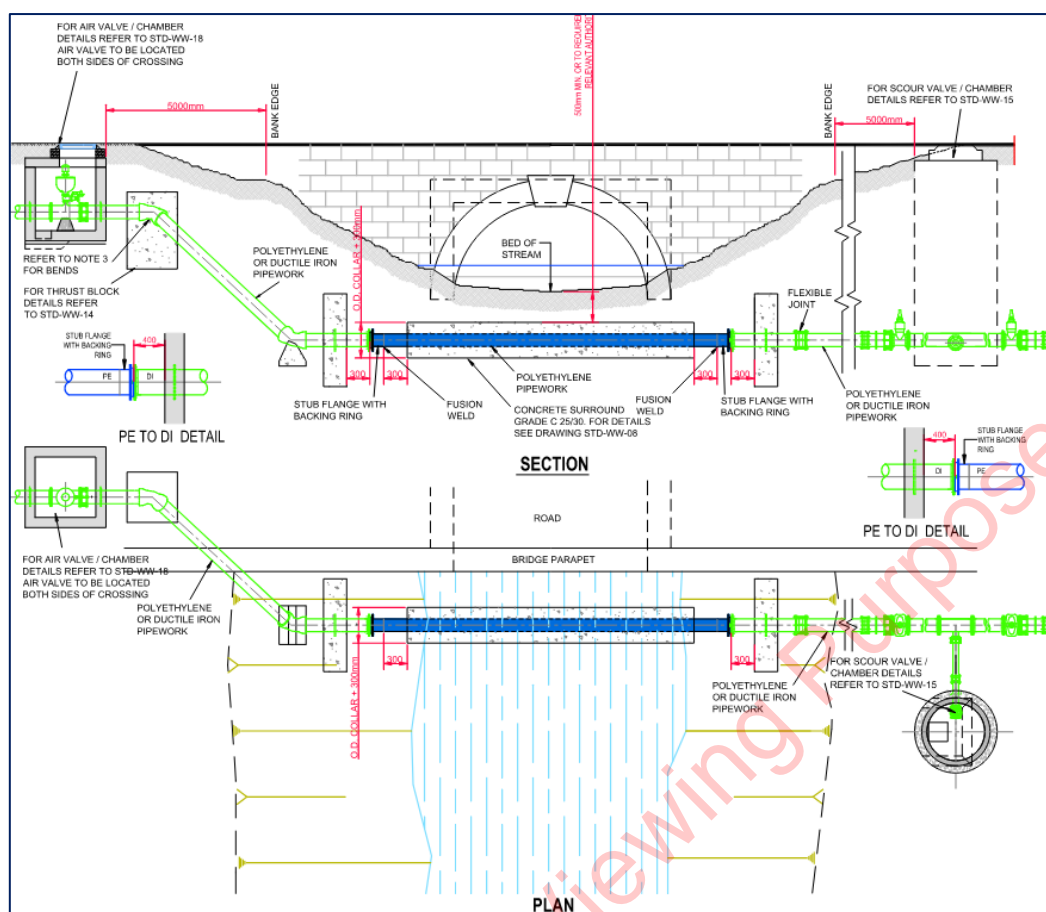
Typical Detail of Rising Main Crossing at Bridge
